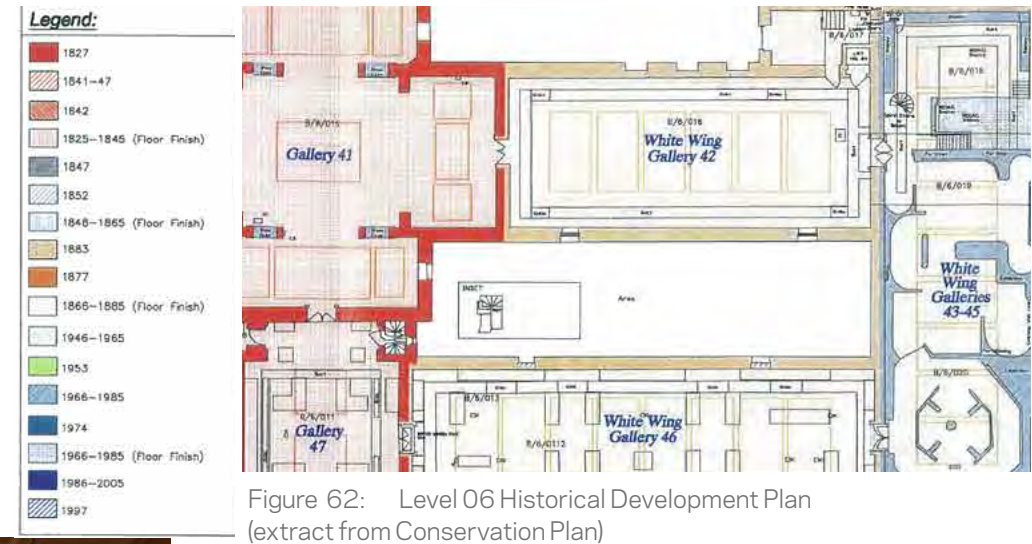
Level 06 Historical Development Plan (extract from Conservation Plan)
